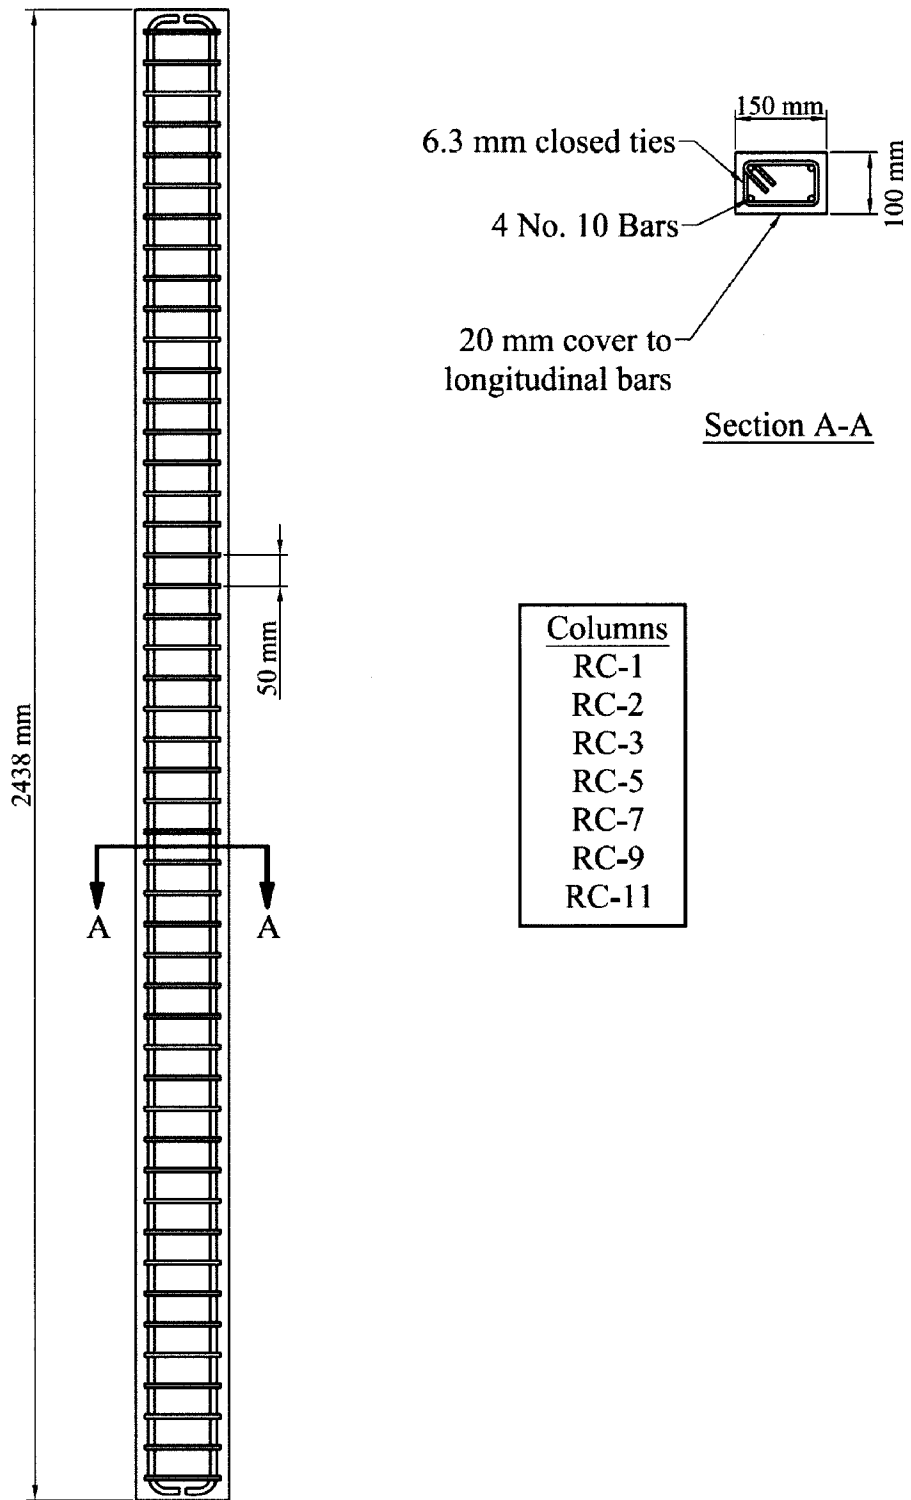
Reinforcement Details of 100x150 mm Non-Seismic Columns
